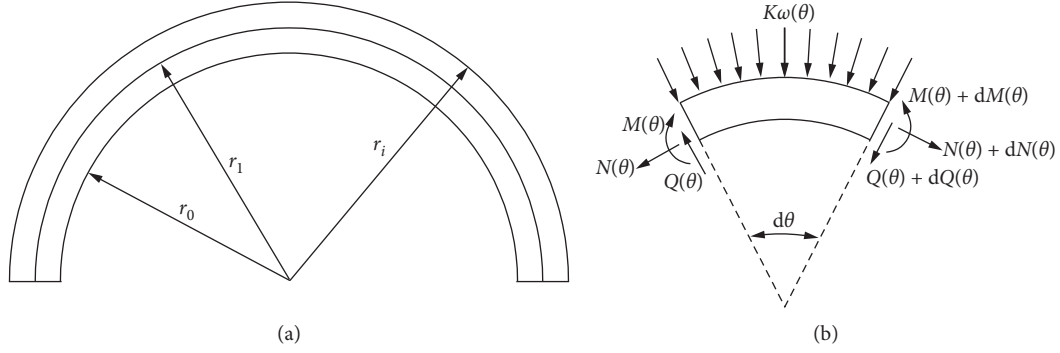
Circular beam on elastic foundation [21]. (a) Dimensions of the tunnel supporting structure. (b) Differential element.
